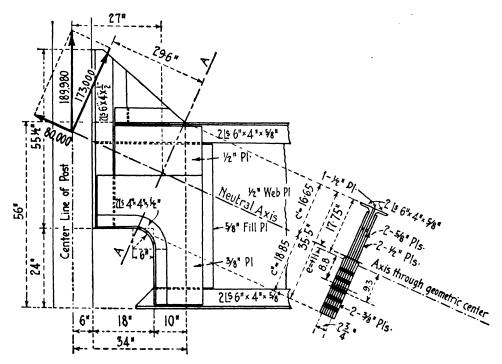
DETAIL OF FLOORBEAM CONNECTION.
